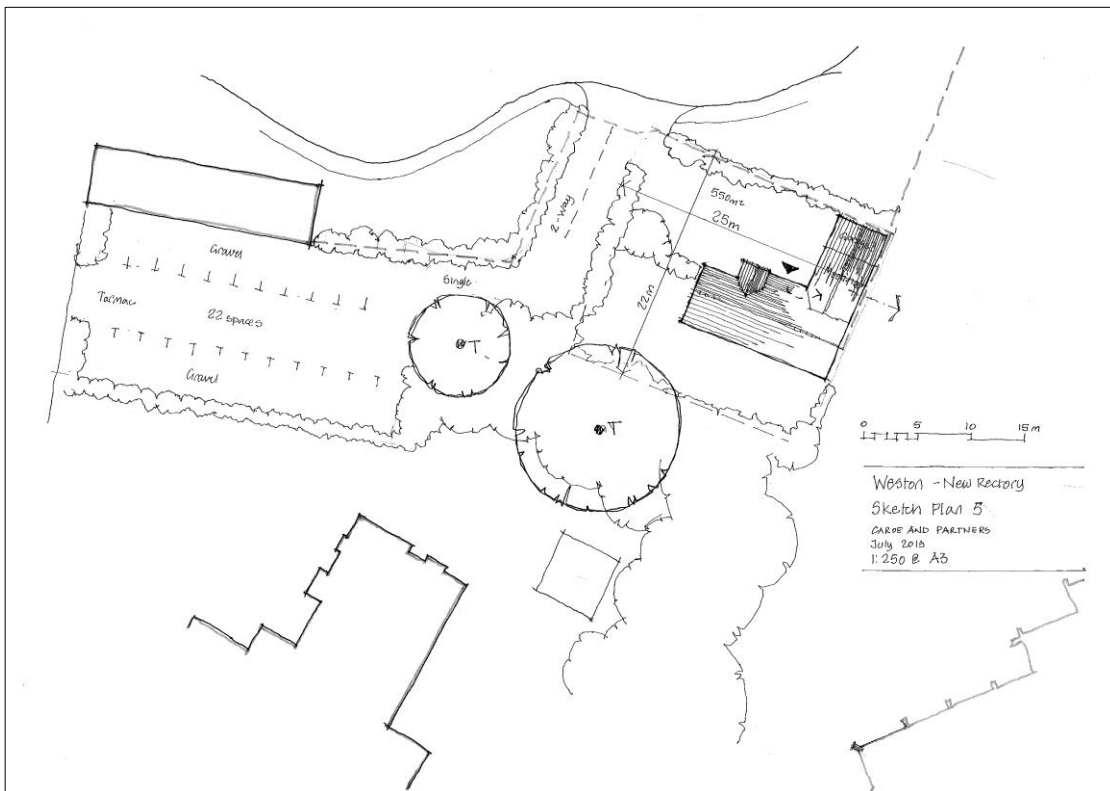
Proposed Site Plan Number 5 © Henry Adams LLP
